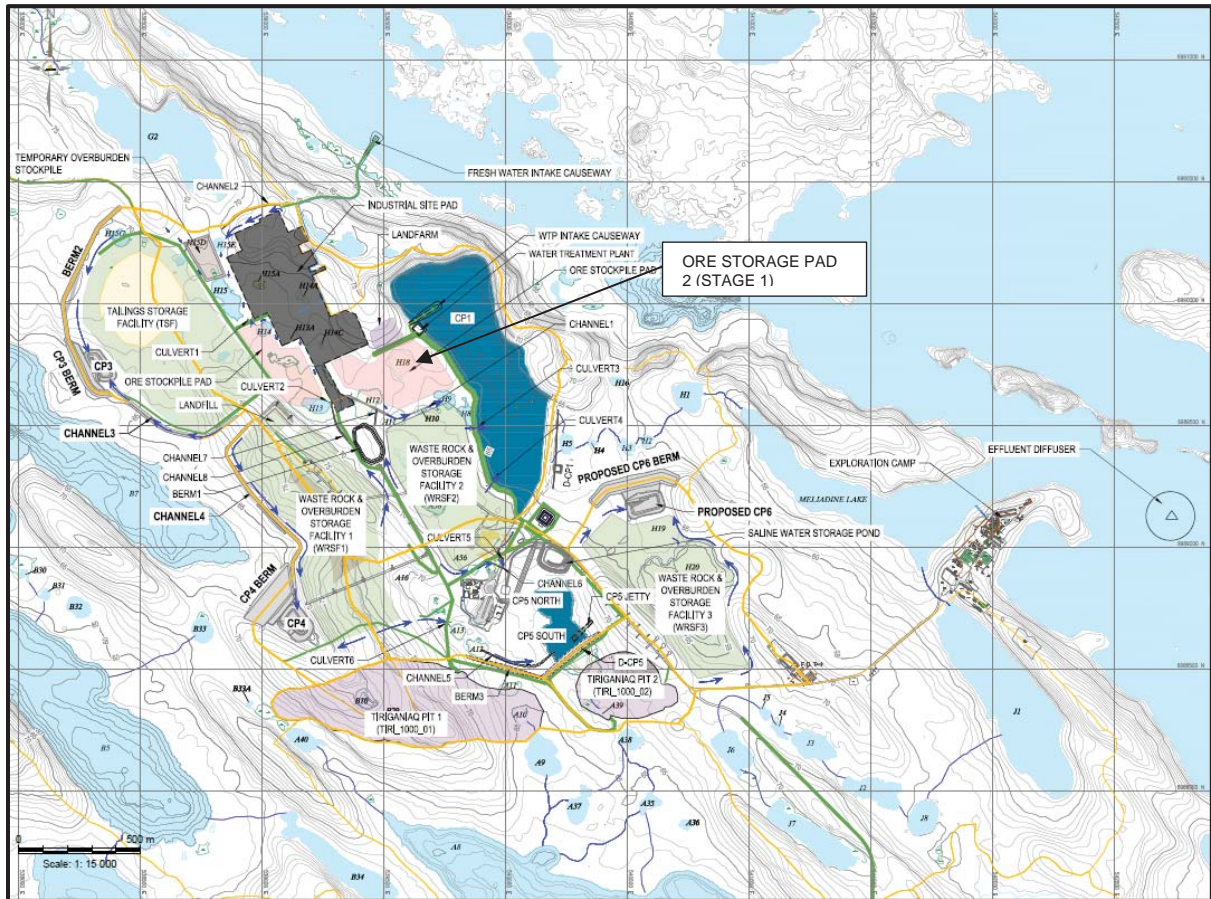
Meliadine site, plan view (Tetra Tech, 2020)
